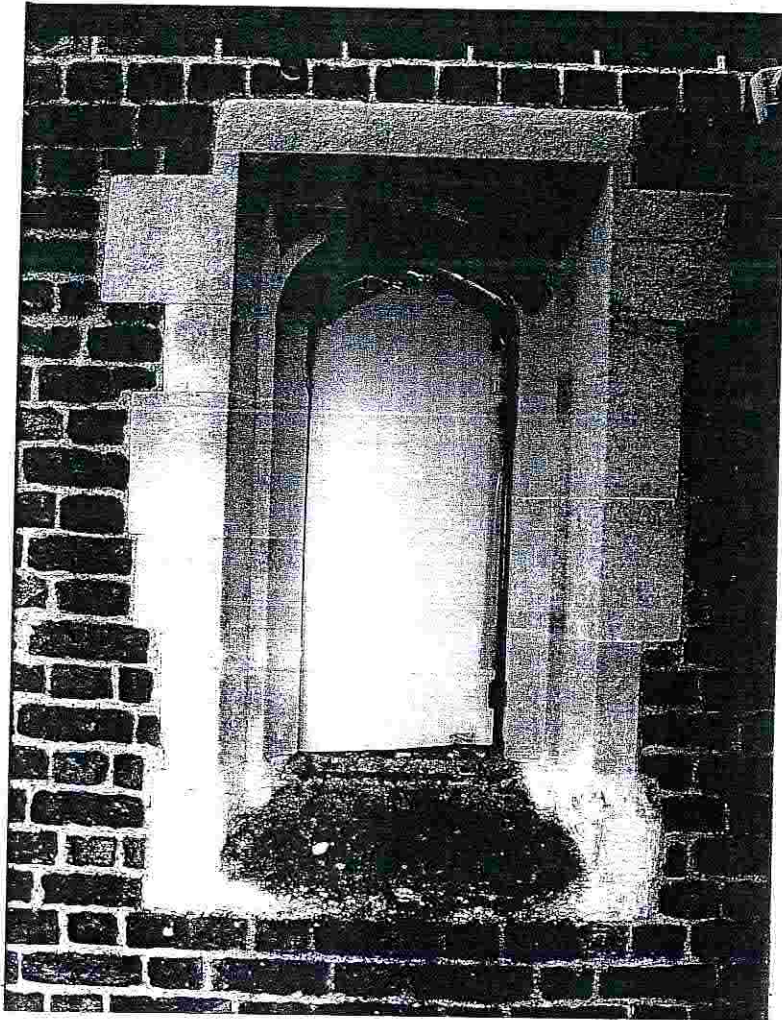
Bath Stone window. 3rd floor Elevation SF4.
